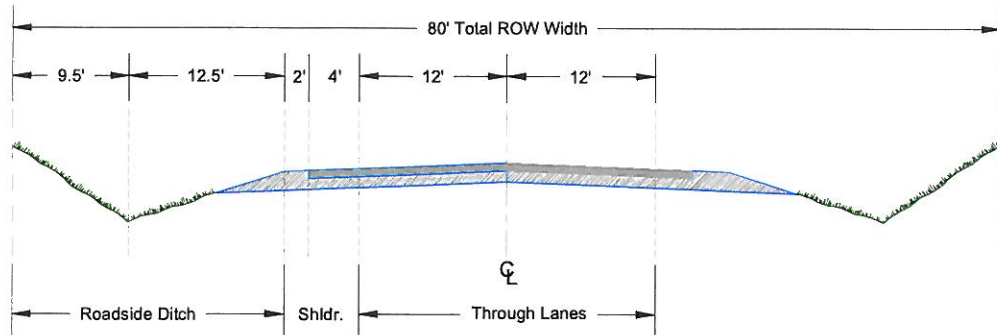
Typical Rural Minor Arterial Partial Cross Section
